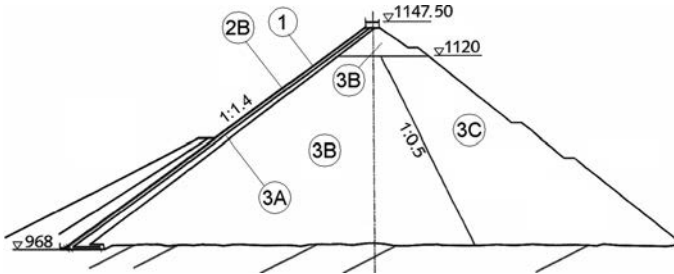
Typical cross-section of Hongjiadu Dam (after Cruz et al., 2009). (1) Concrete face slab; (3A, 2B, 3B and 3C) – see Table 8.2.
